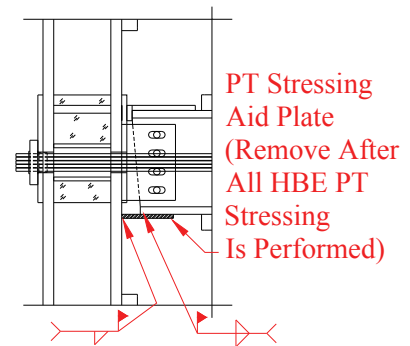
Specimen NZ construction: Step 2 – install temporary HBE PT bars
